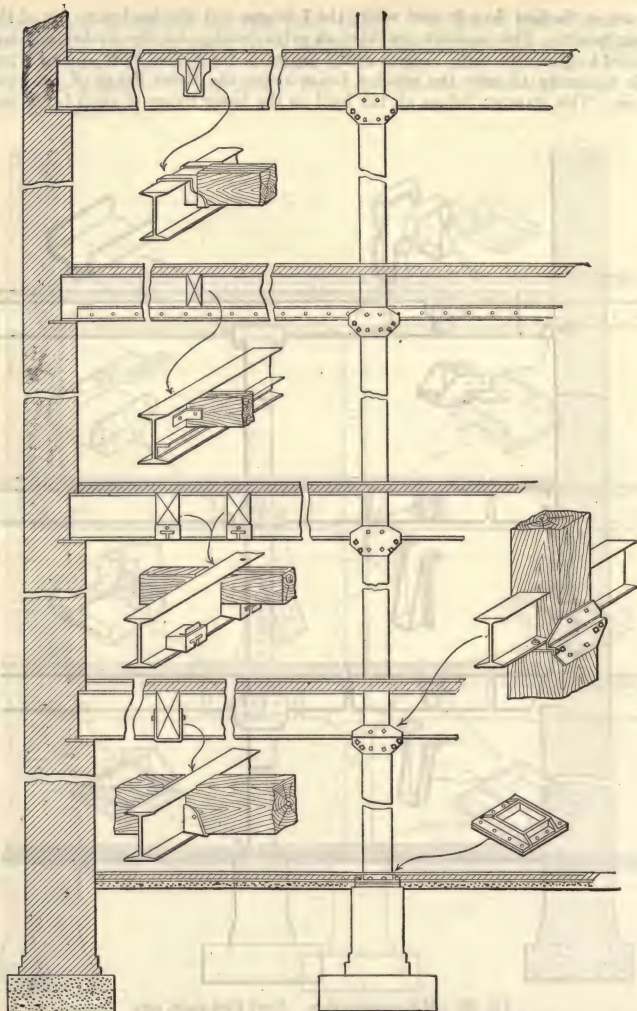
Mill-construction. Framing Steel Beams and Girders
